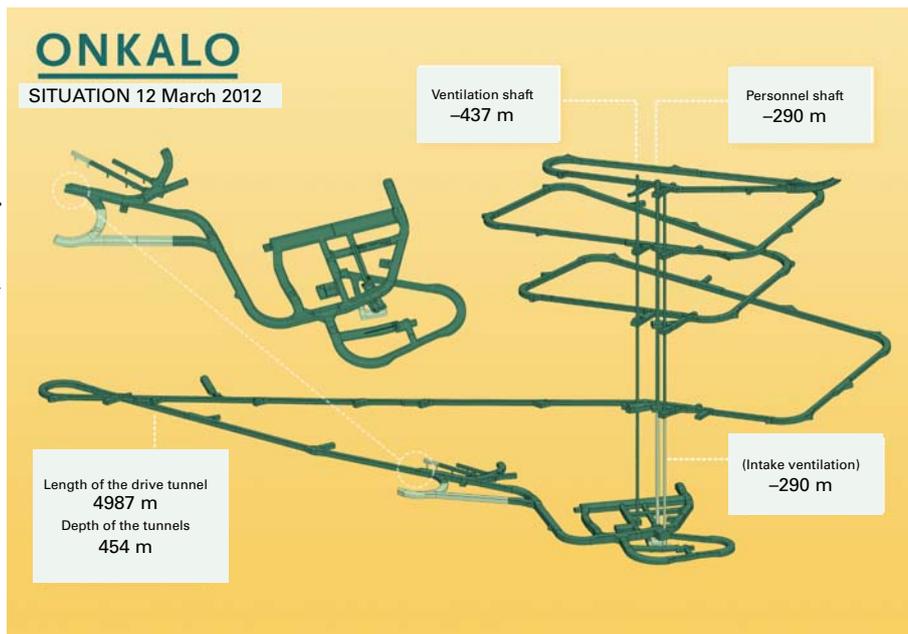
Plan of the underground rock characterisation facility (Onkalo) and status of the construction on 12 March 2012 (Posiva Oy).
